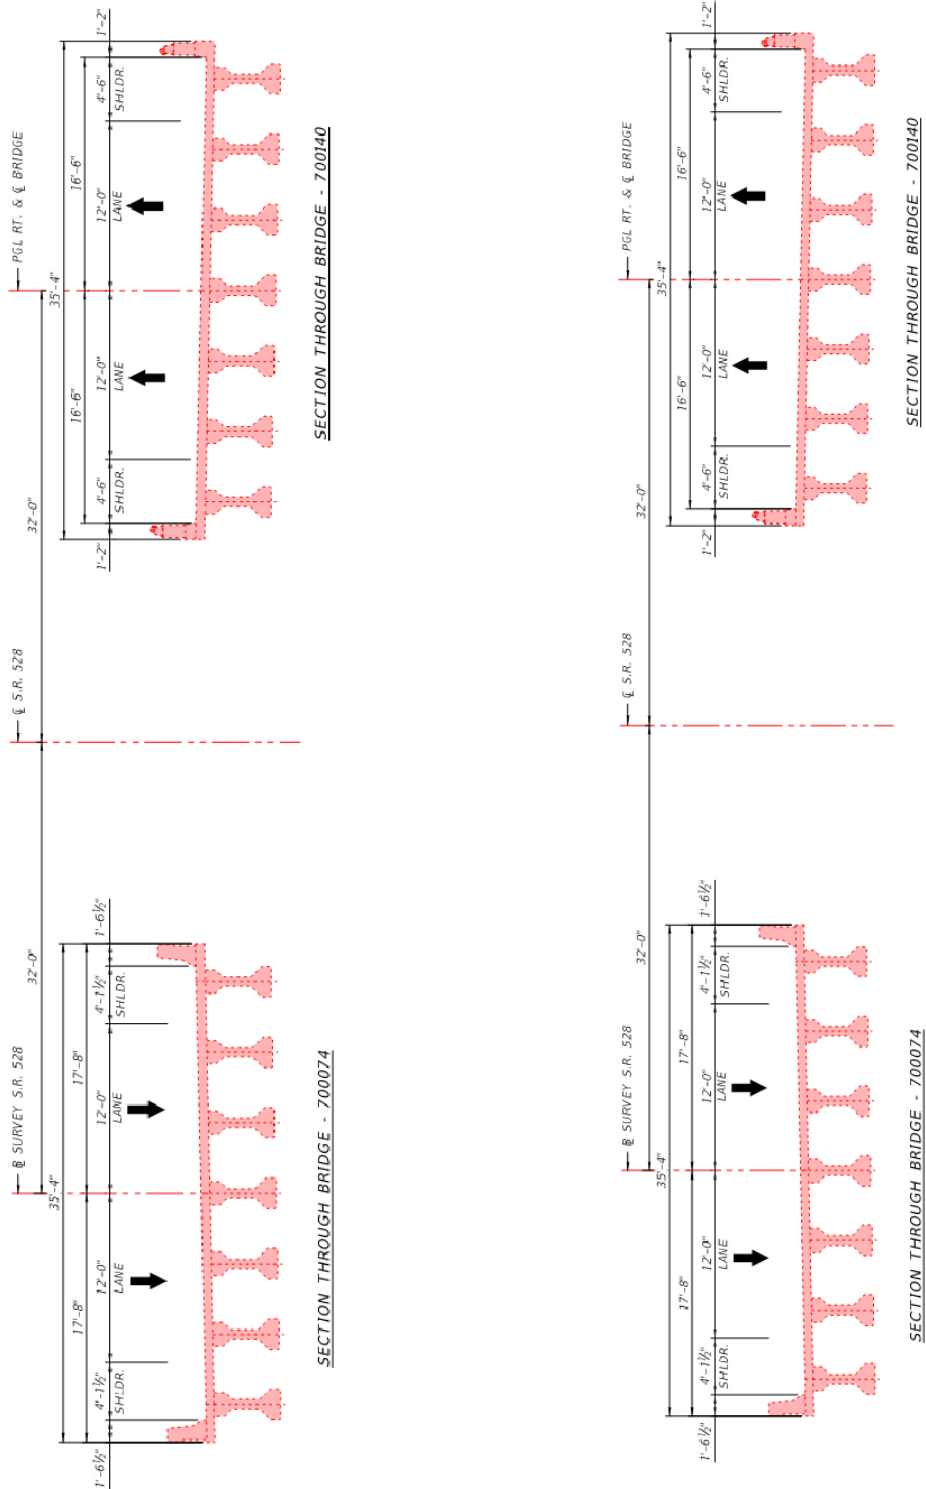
Typical Section of the S.R. 528 Bridges over S.R. 401
